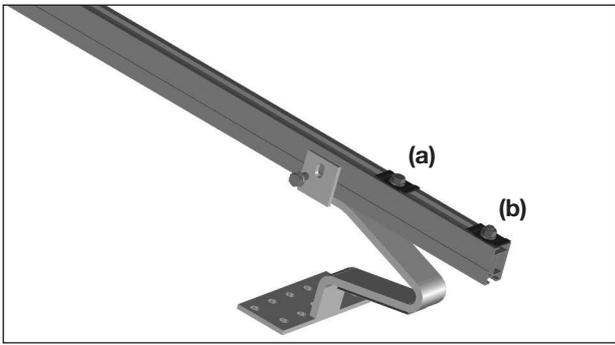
Fitting of roof hooks (Illustr. roof hook item no. 1361262)
